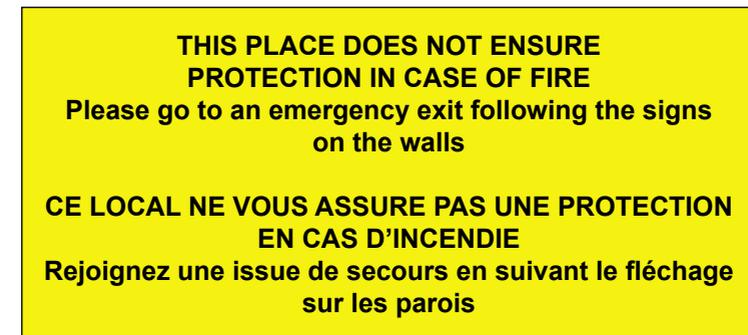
Example of text to warn tunnel users that emergency stations with doors are not suited for protection against fire
